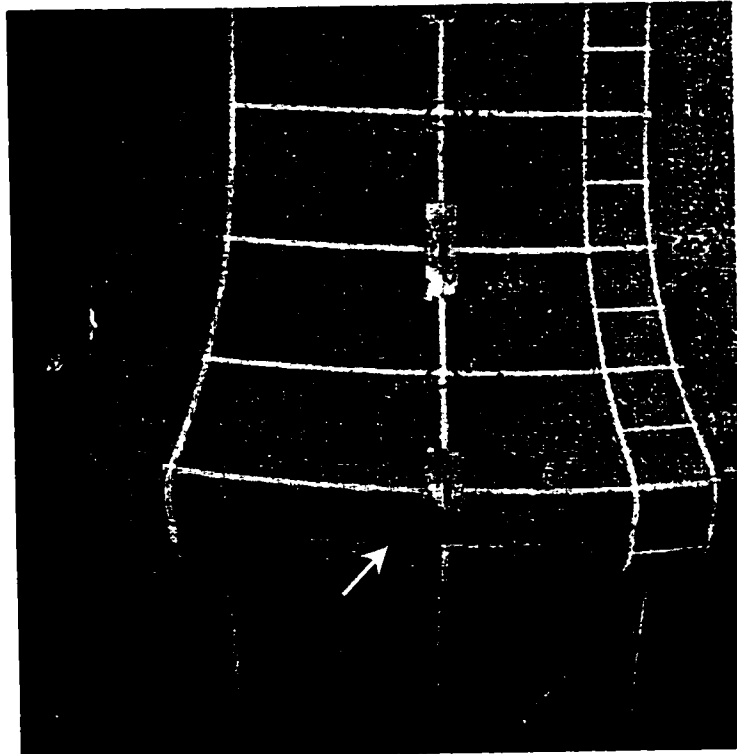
Wrinkle of Pipe L178P80BP-4
